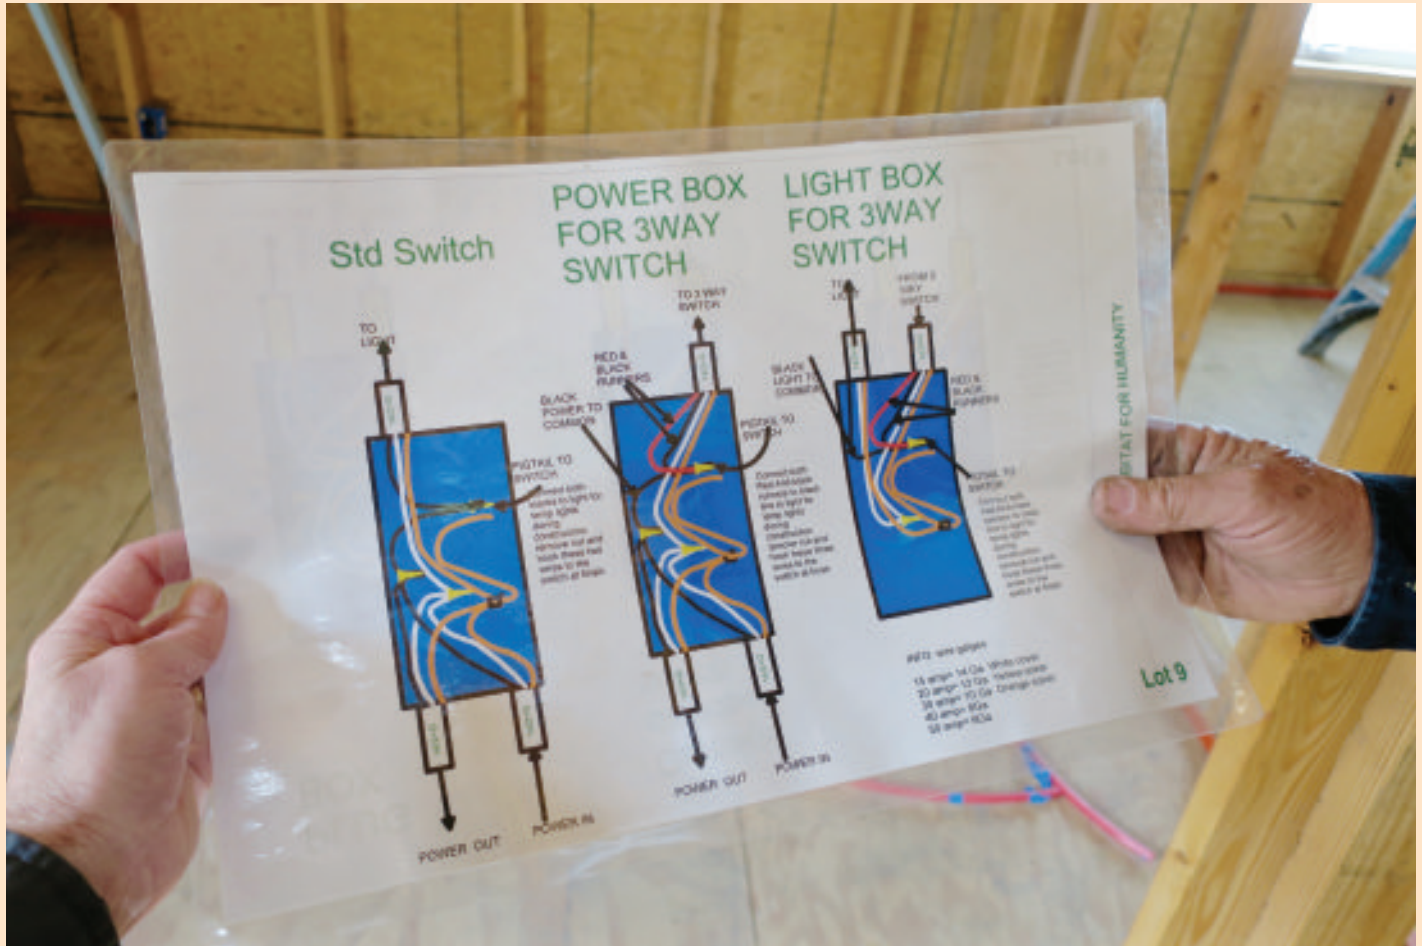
Clear, color-coded wiring diagrams improve installation
